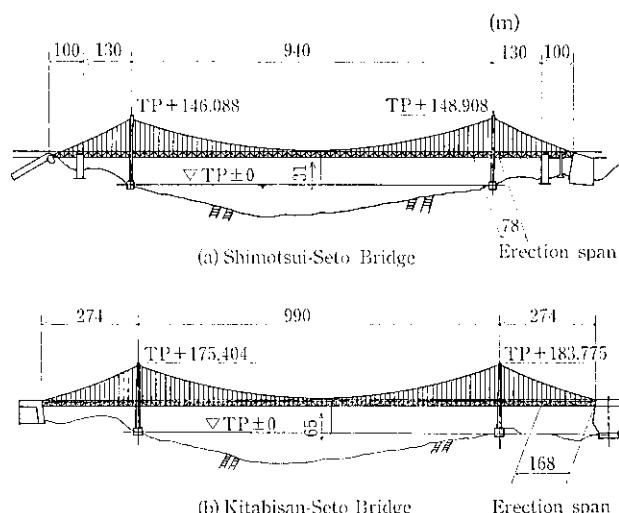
General view of Honshu-Shikoku Bridge and the location of Shimotsuisan and Kitabisan stiffening trusses
